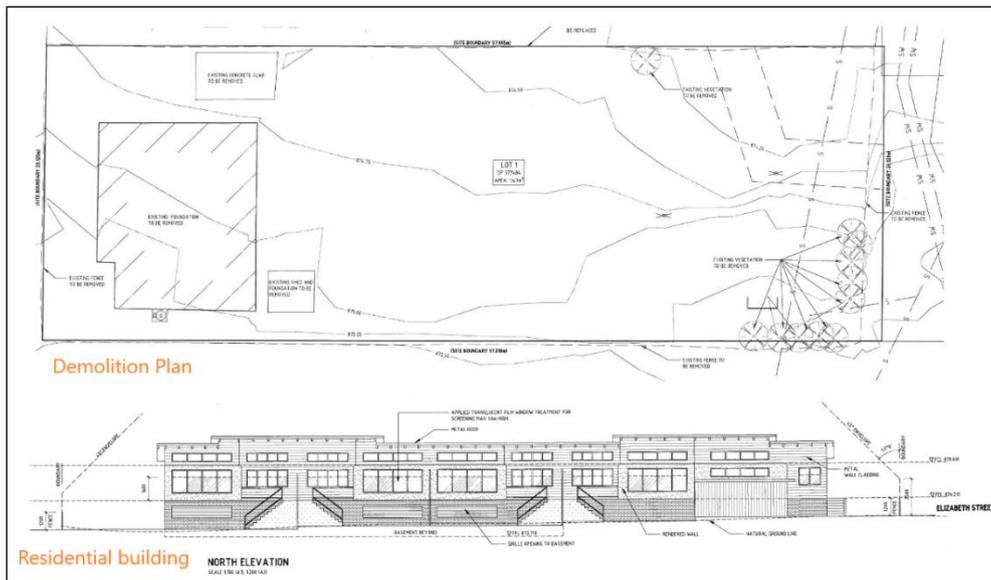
Previously approved plan for demolition and construction of residential buildings
